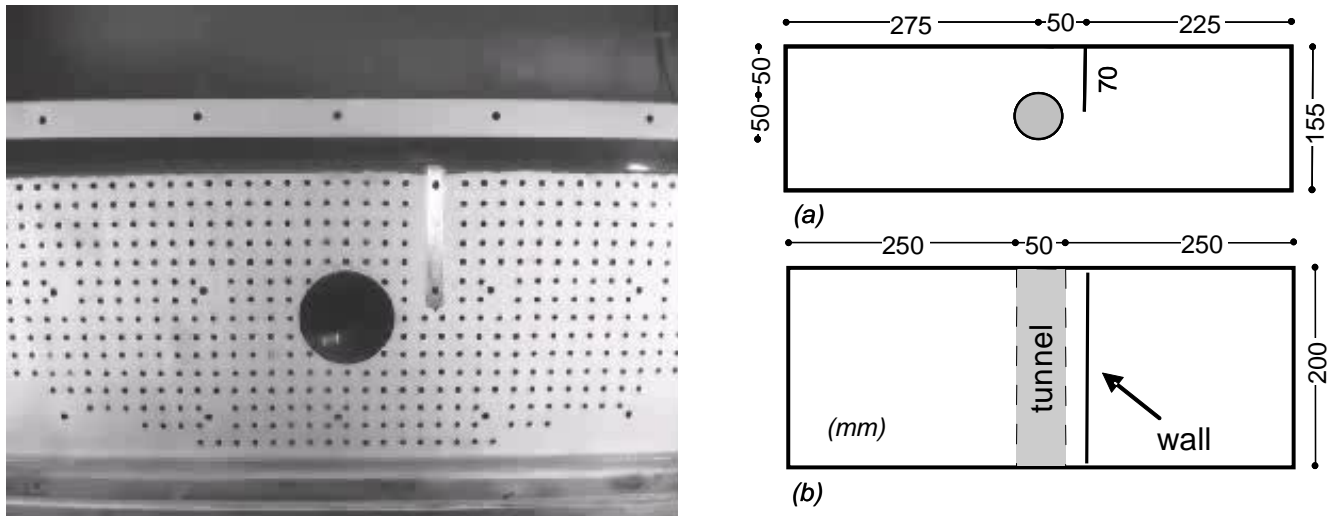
Front picture, elevation (a) and plan (b) of the model
